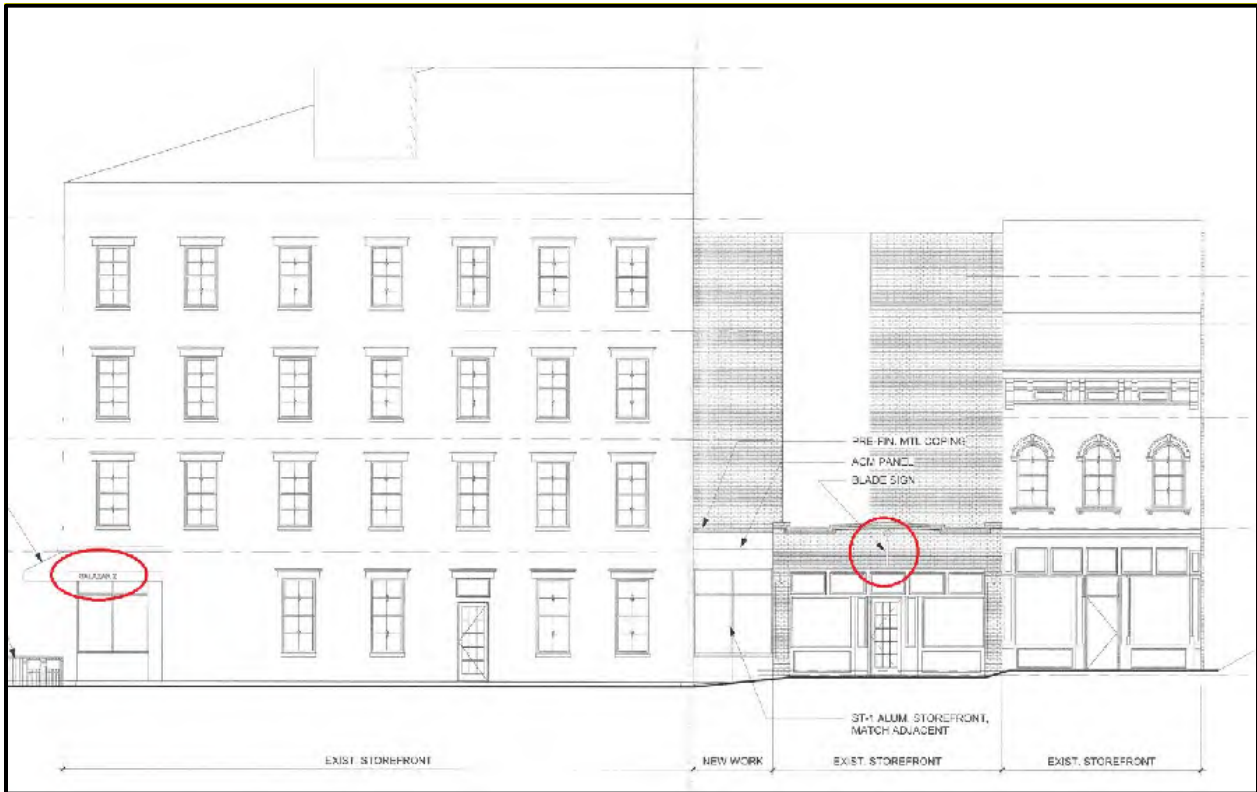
Elevation drawings from 2018P09369 showing proposed south elevation signage.
